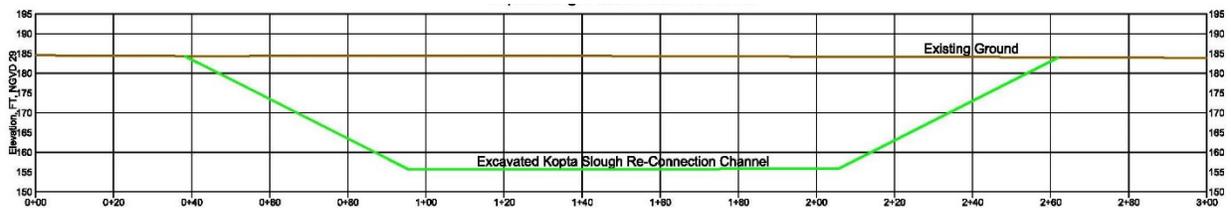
Cross Section of proposed Kopta Slough Connection Channel
